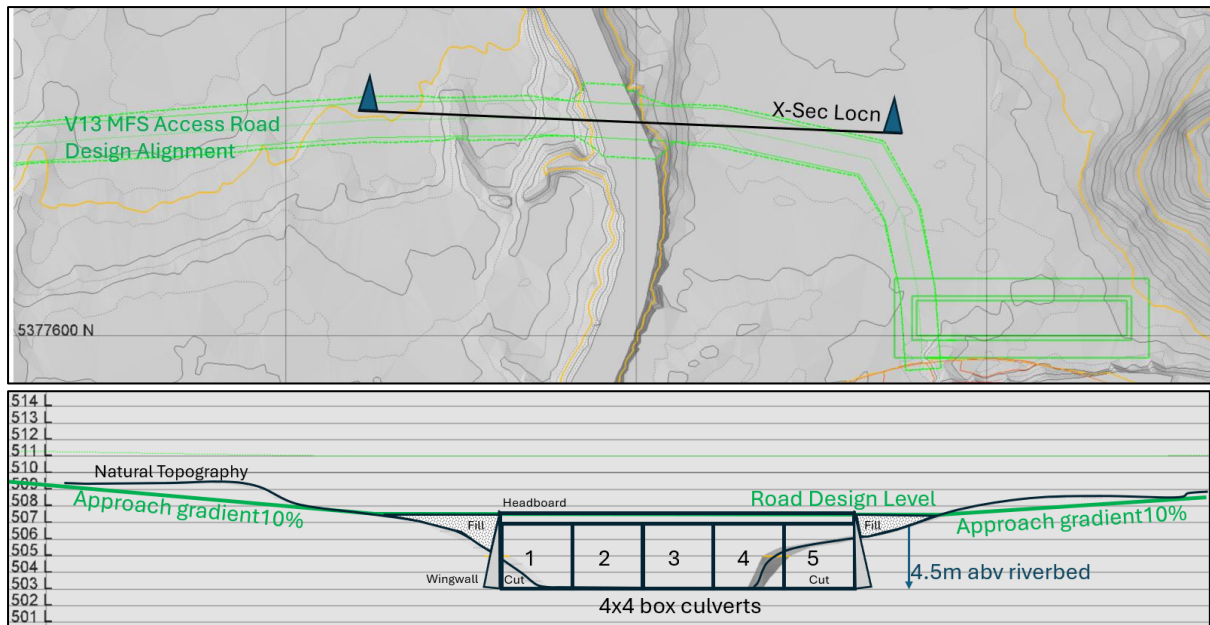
Proposed Waimangaroa River road crossing with culverts within existing river channel (indicative dimensions only).
